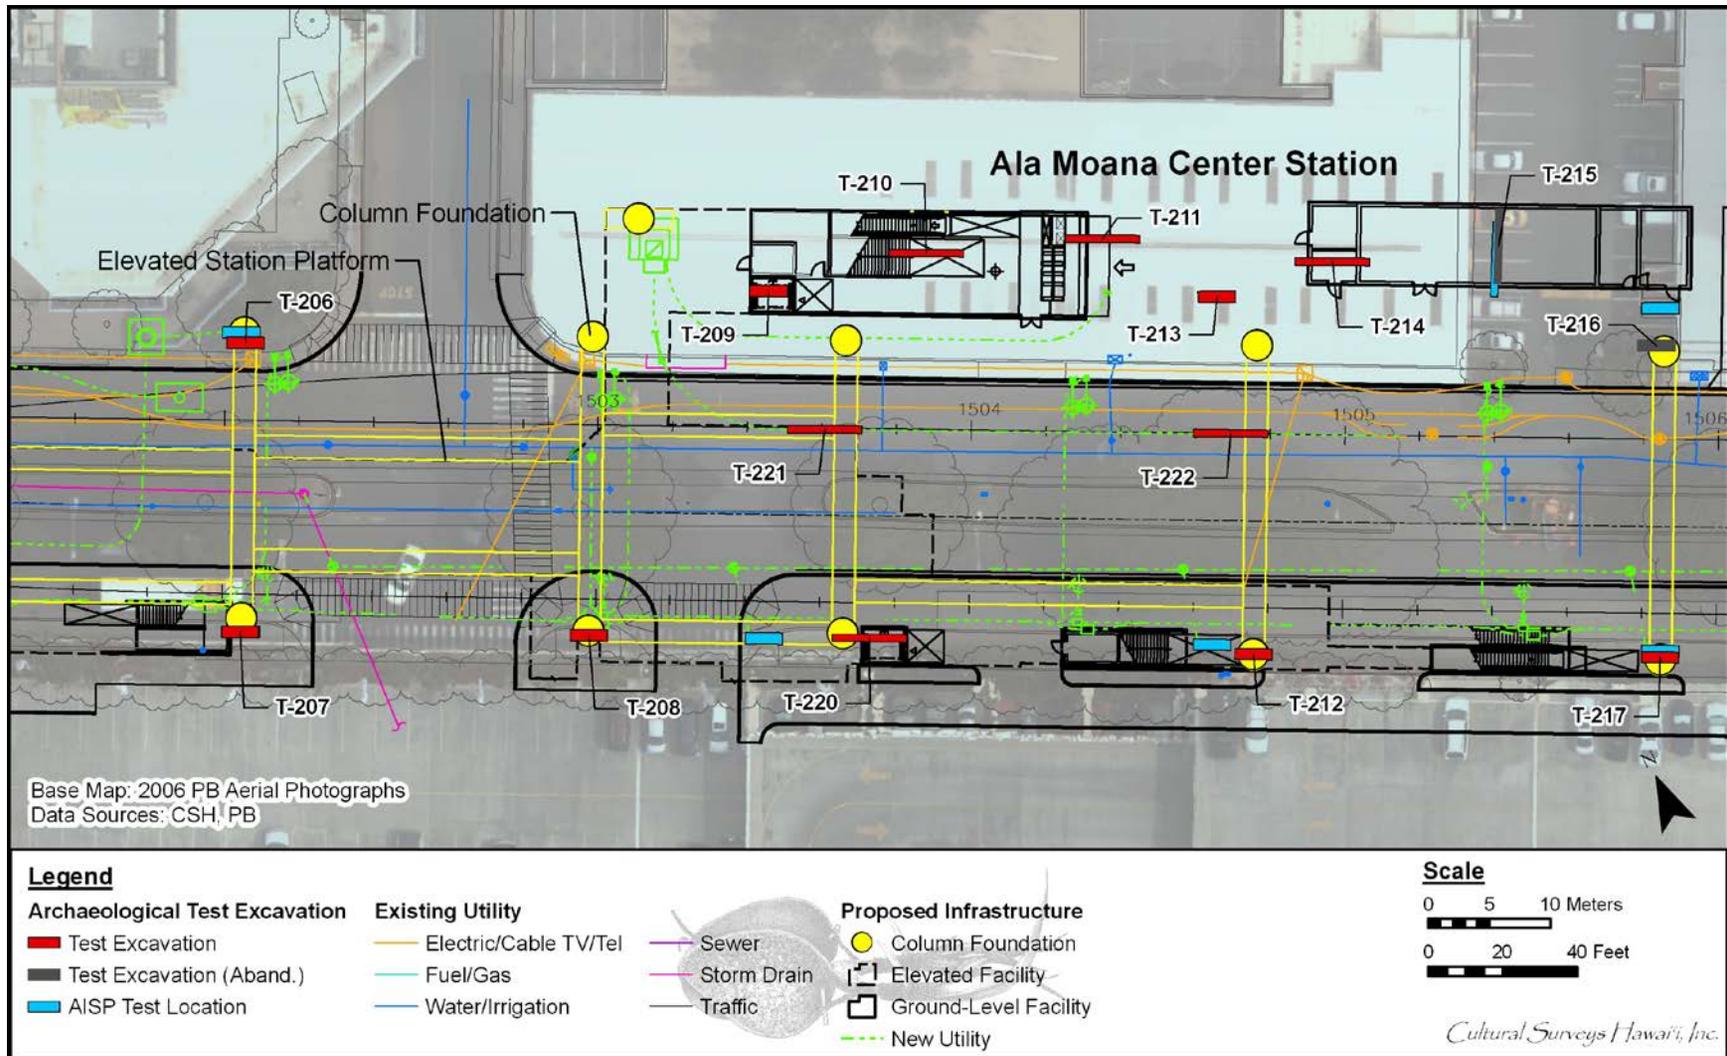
Ala Moana Center Station, detail of column foundation layout showing locations of proposed AISP and actual AIS test excavations
